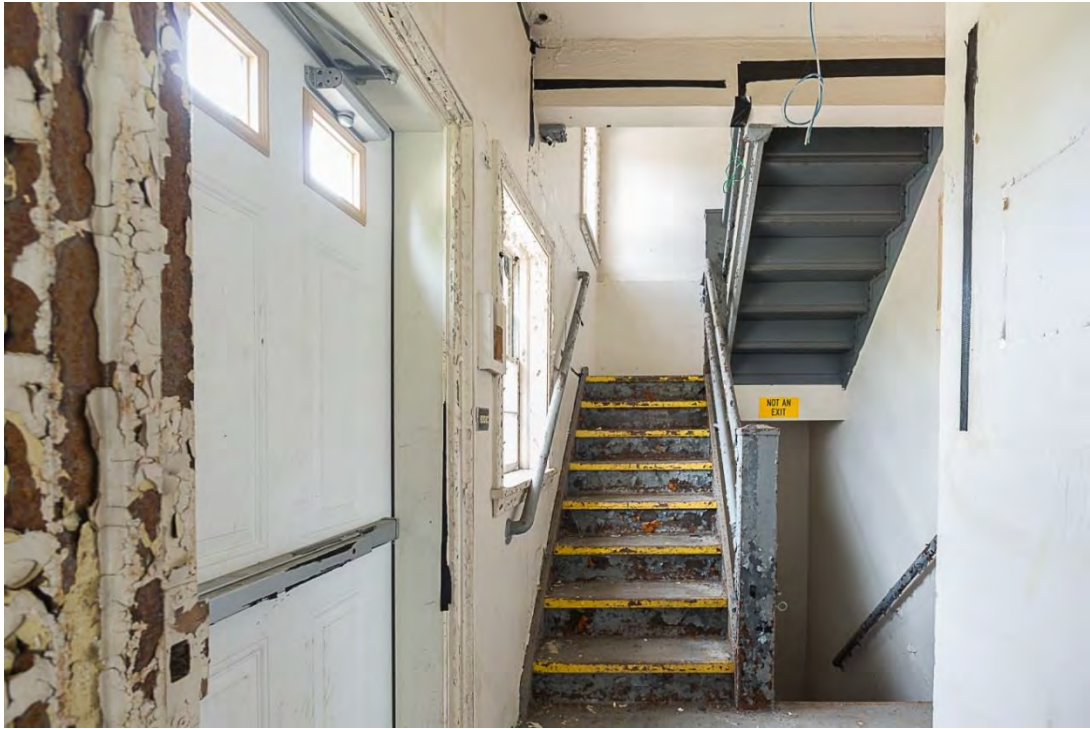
Building 1, first floor interior view northeast showing steel stairs.
